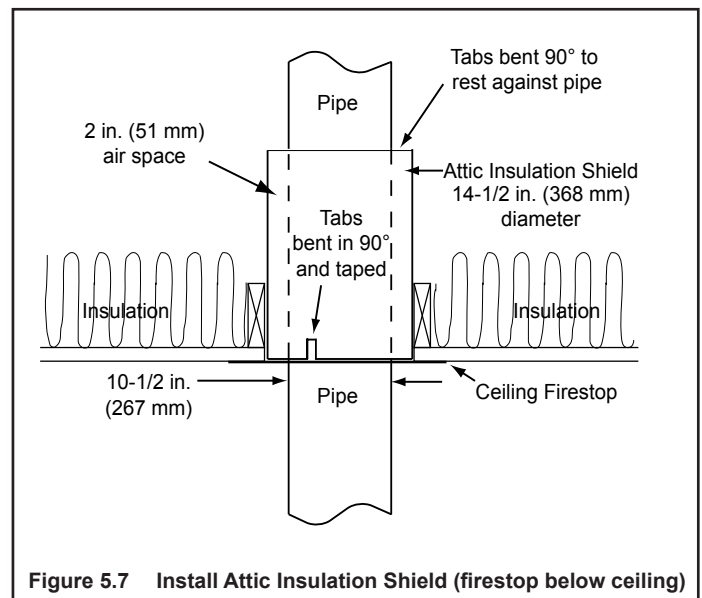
Install Attic Insulation Shield (firestop below ceiling)
